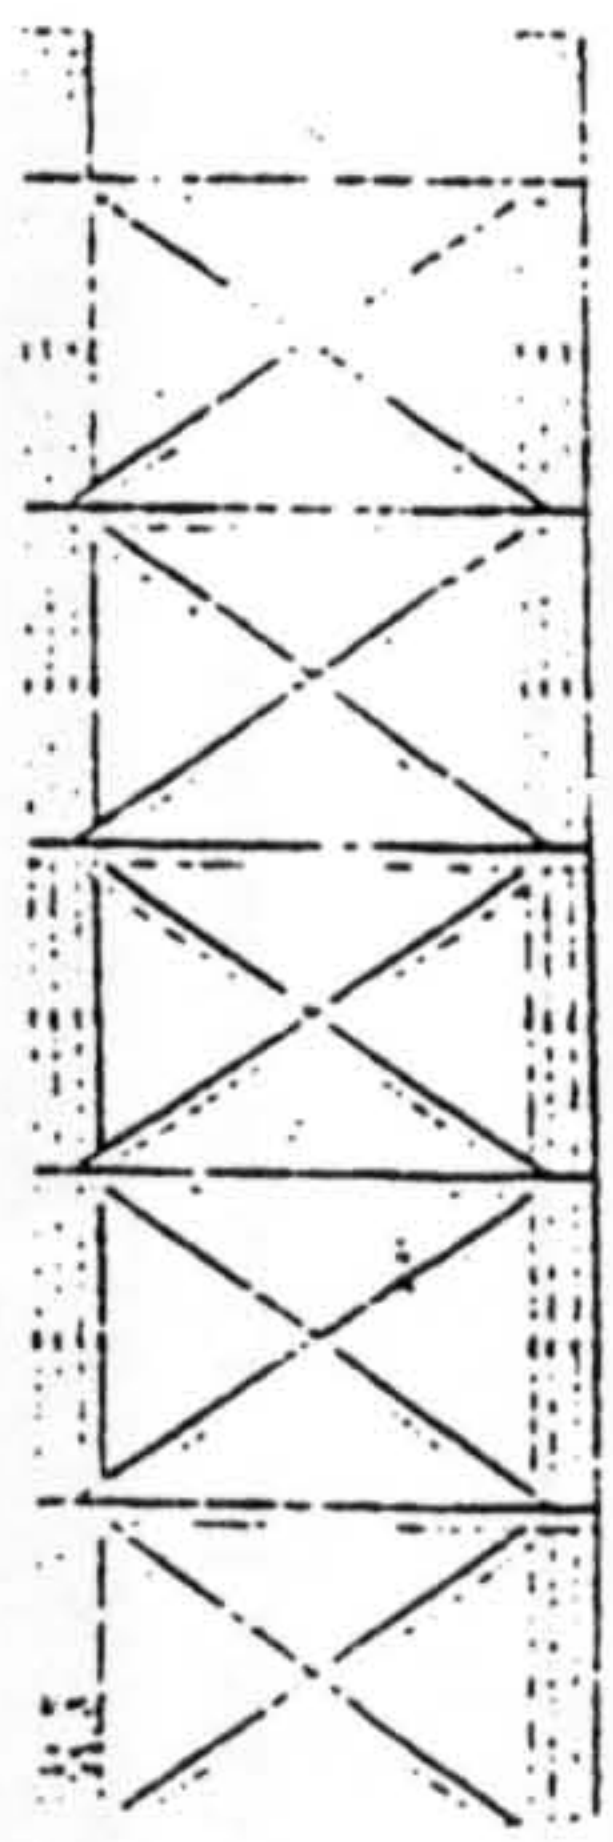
Howe timber bridge at Chilapac River, Connecticut.
